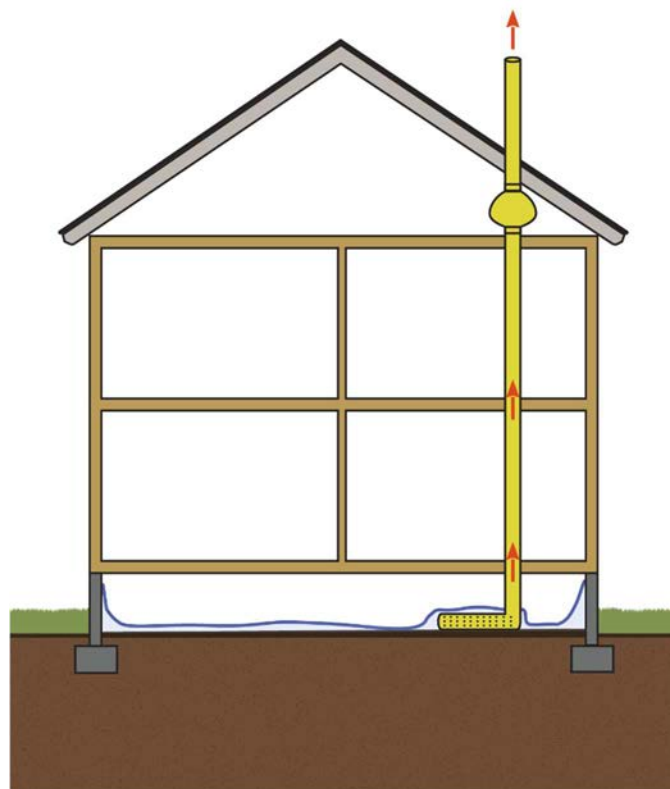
Sub-membrane depressurization with internal fan and roof level exhaust.
